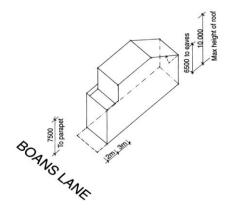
Building Envelope for Lot 10 Boans Lane.
